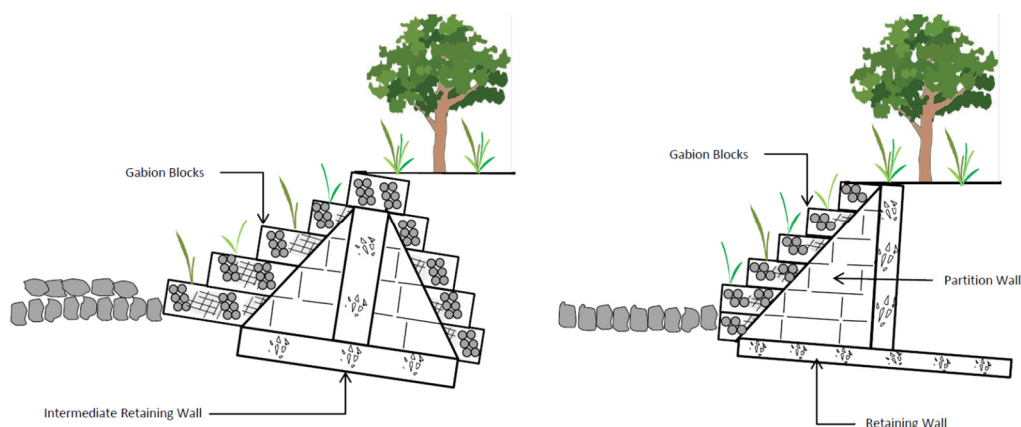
COMPOSITE STRUCTURE OF CONCRETE RETAINING WALL WITH GABION LINING
